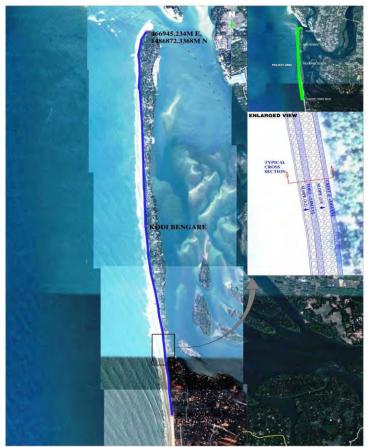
Layout of Proposed Rock Revetment at Kodi Bengre
